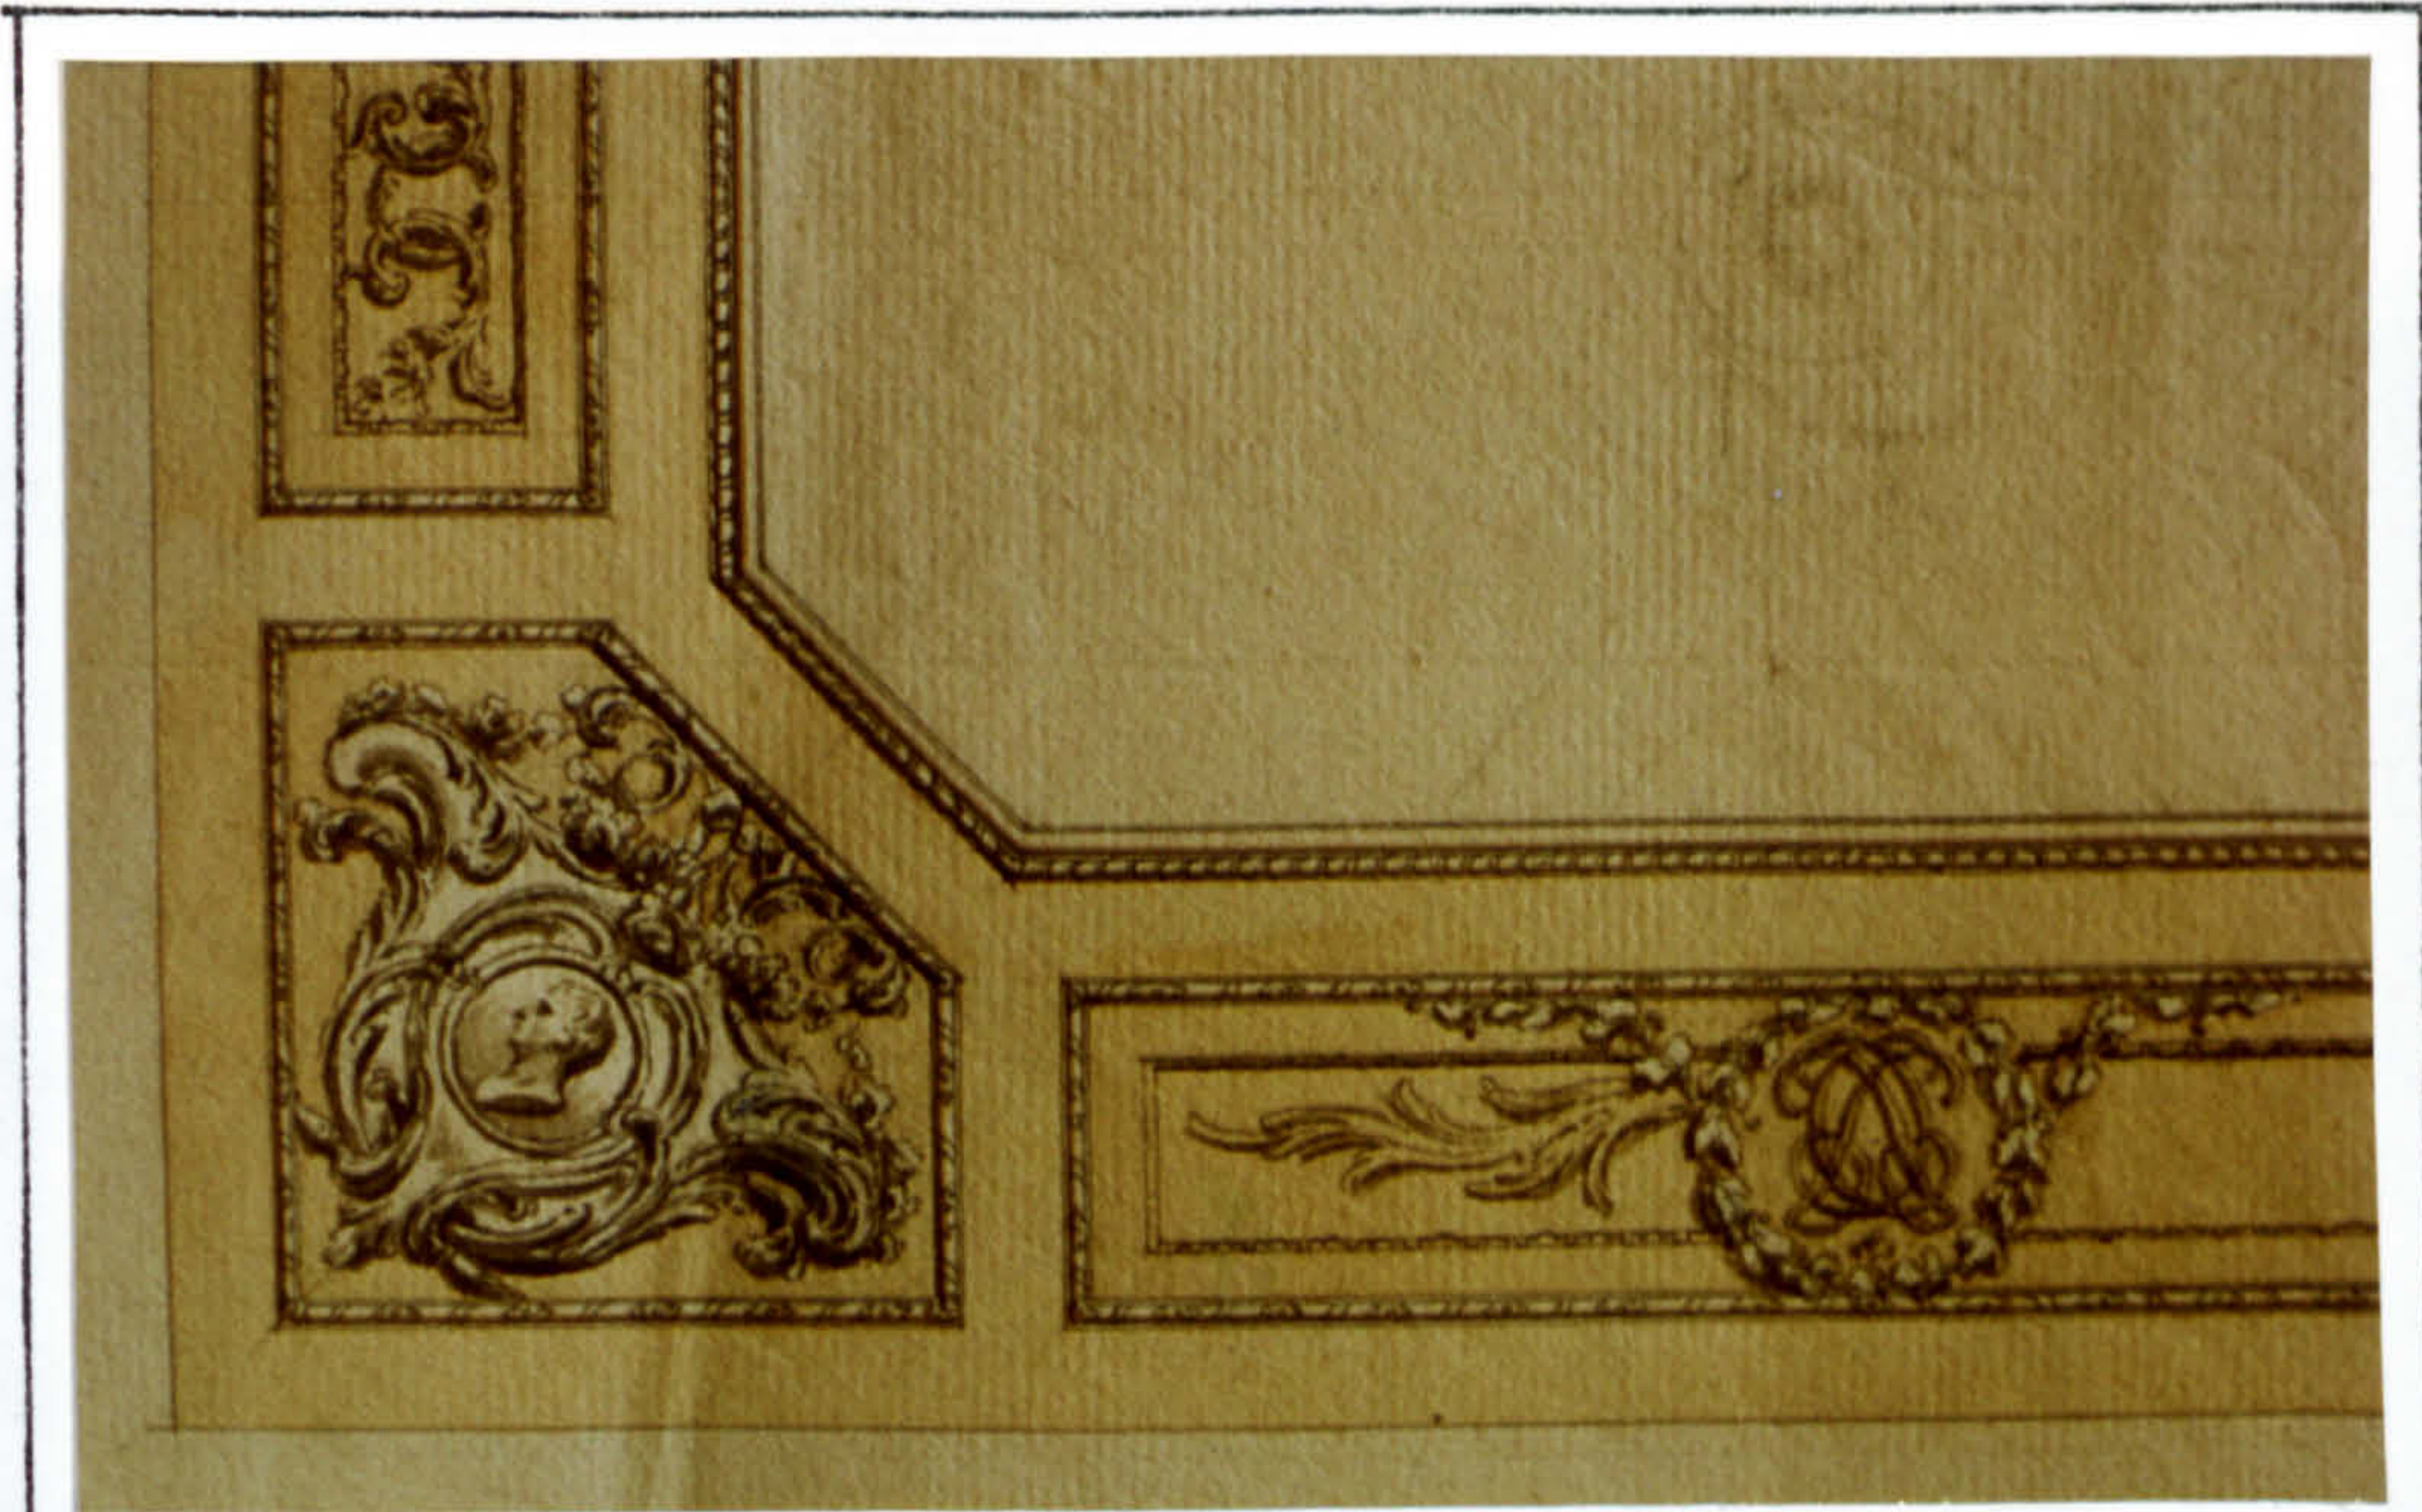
ROBERT ADAM · CEILING FOR ANTE-ROOM IN THE EARL OF KERRY'S HOUSE IN PORTLAND PLACE · 1774
